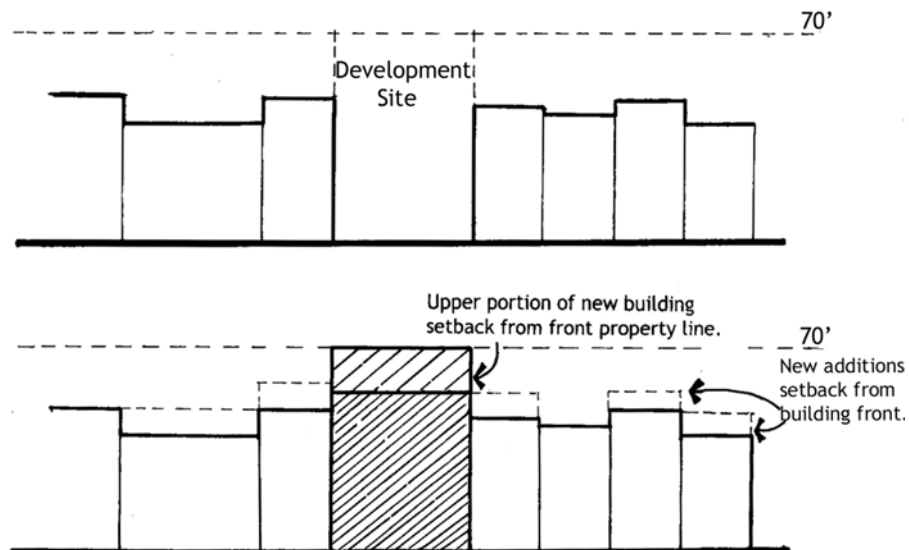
A Street Wall Condition of Consistent Low Scale Height
